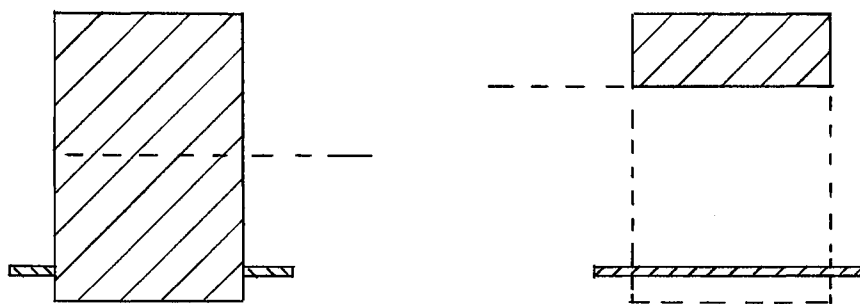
Location of Neutral Axis in a Cracked, Reinforced Concrete Beam
